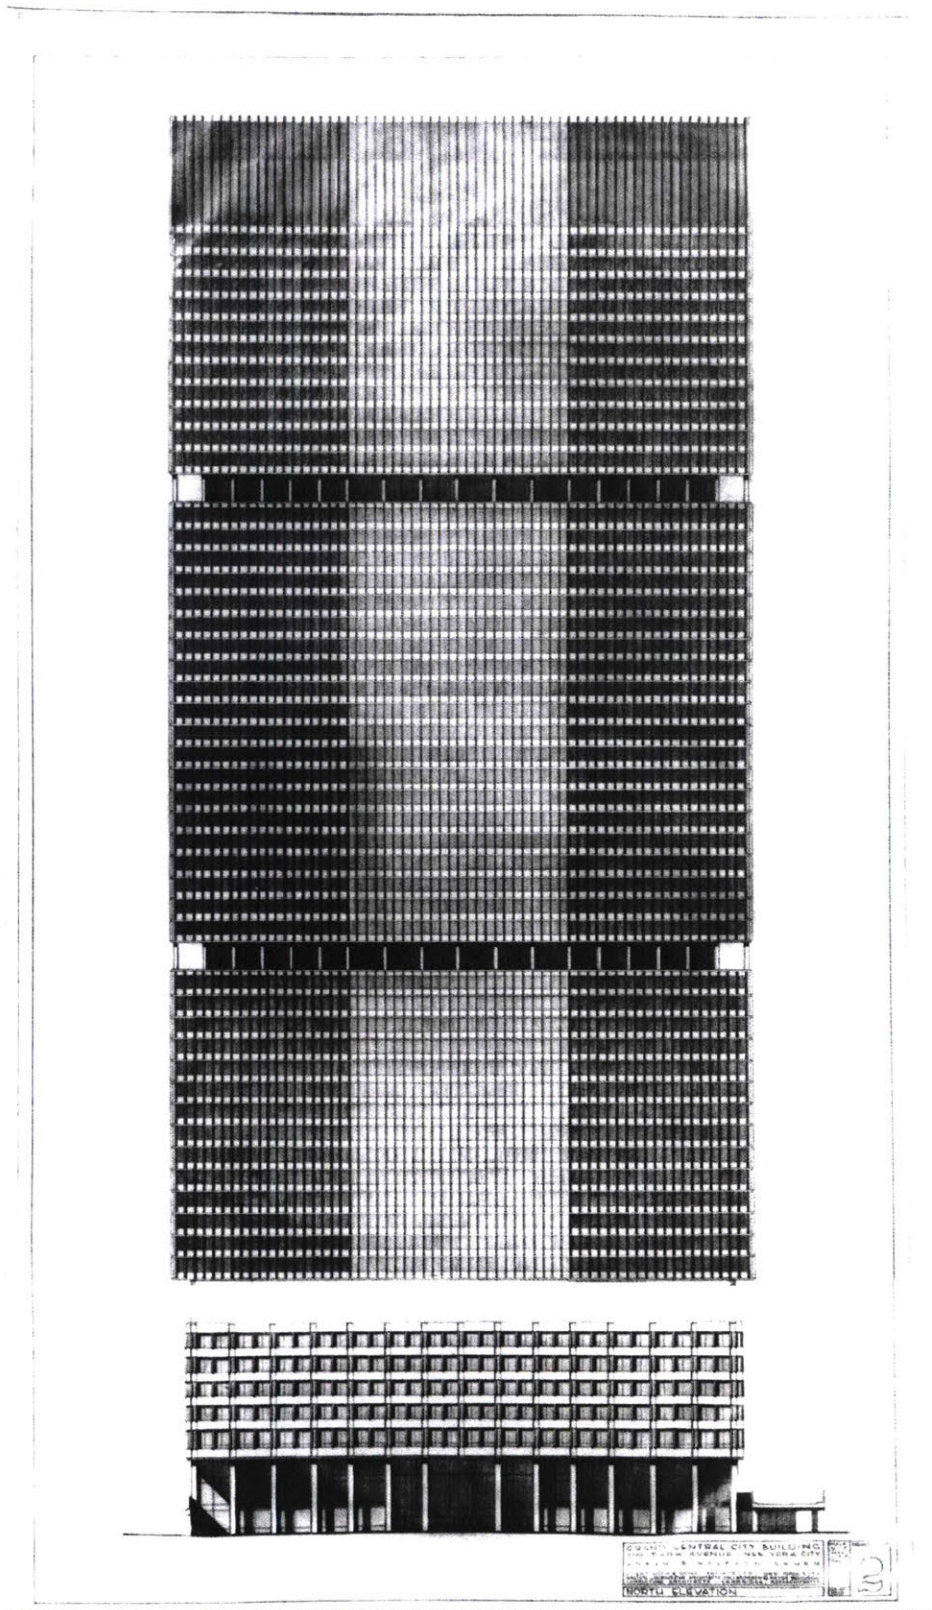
Pan American Airways Building, north elevation. Drawing by TAC office (?). Walter Gropius Archive, 5819.9.
